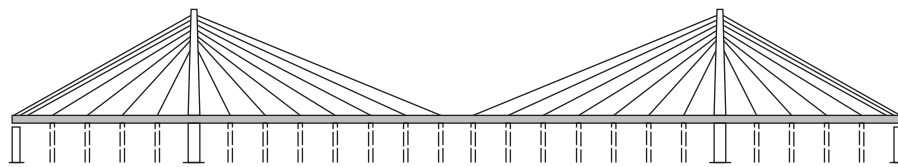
Approach span supported on brackets at the end of the main bridge deck (Köhlbrand Bridge)
